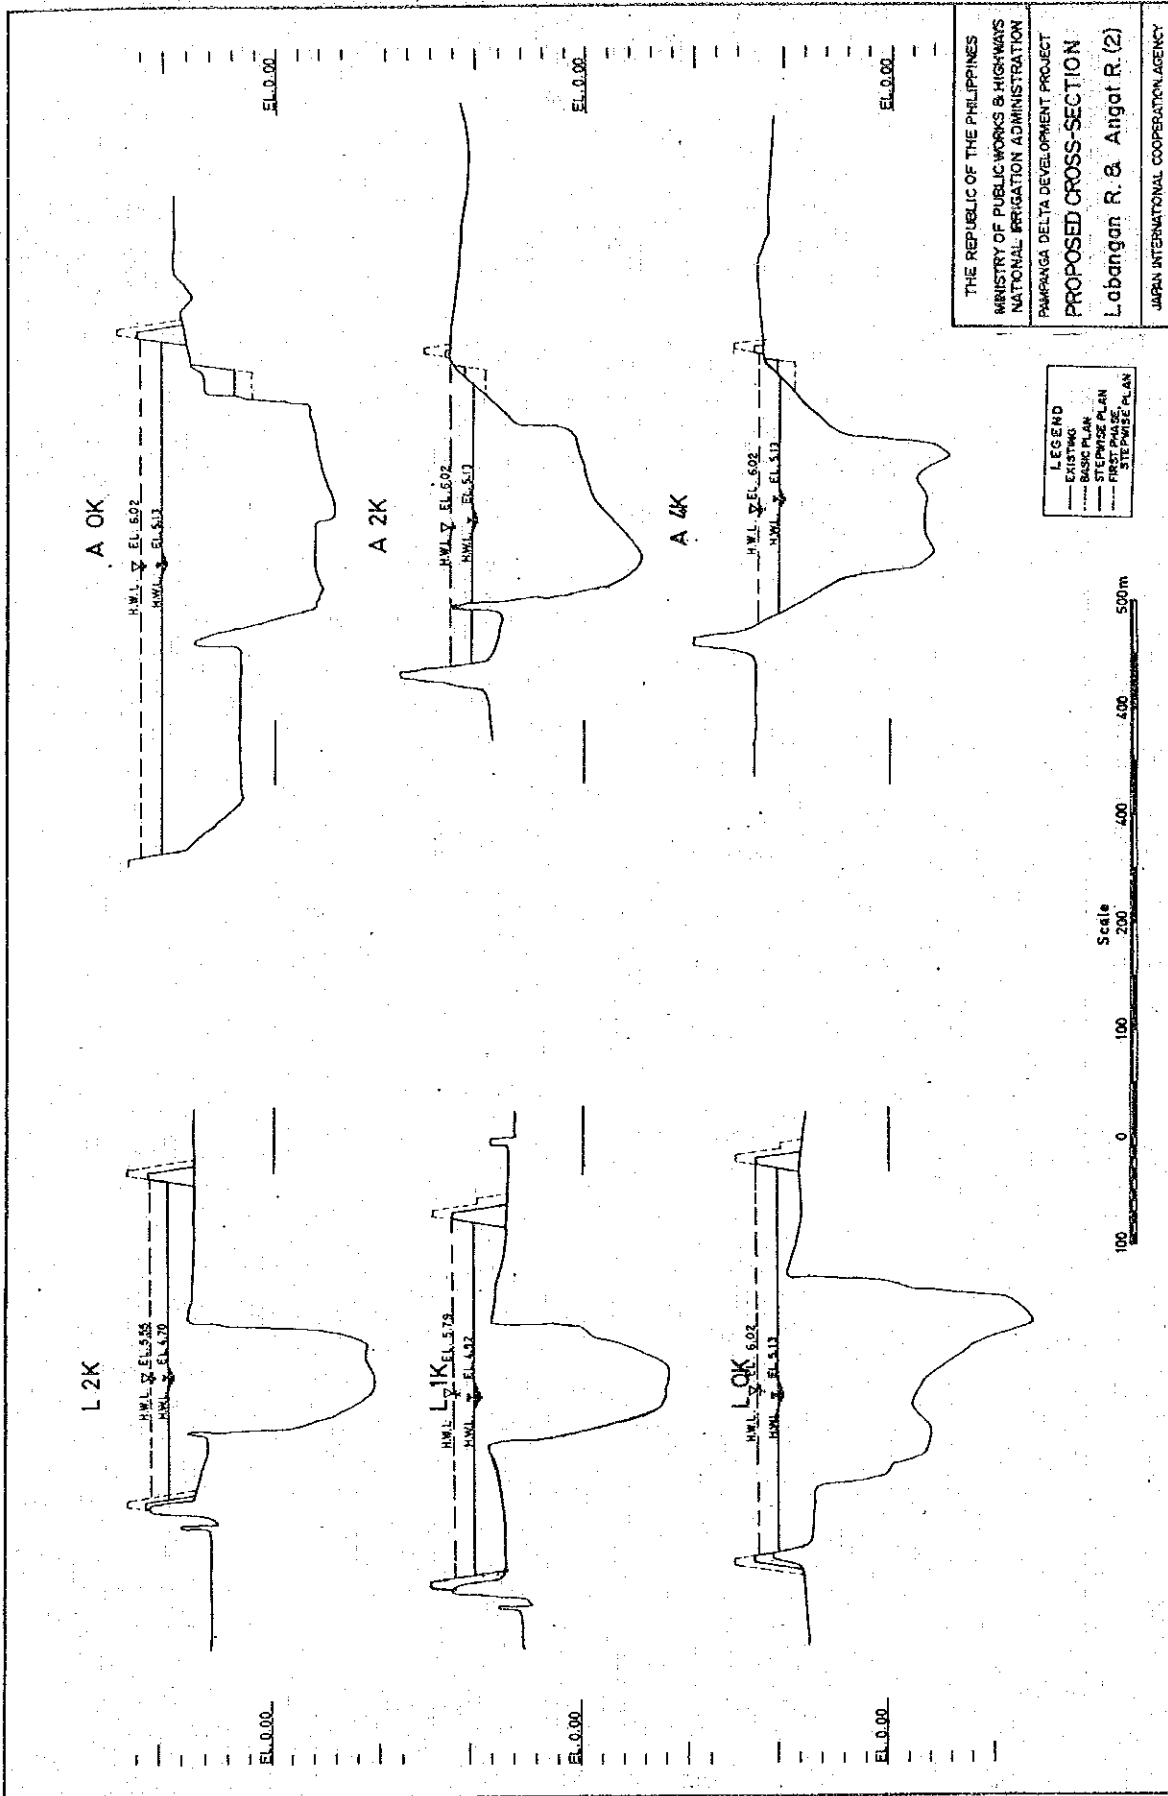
(15) PROPOSED CHANNEL CROSS-SECTION
